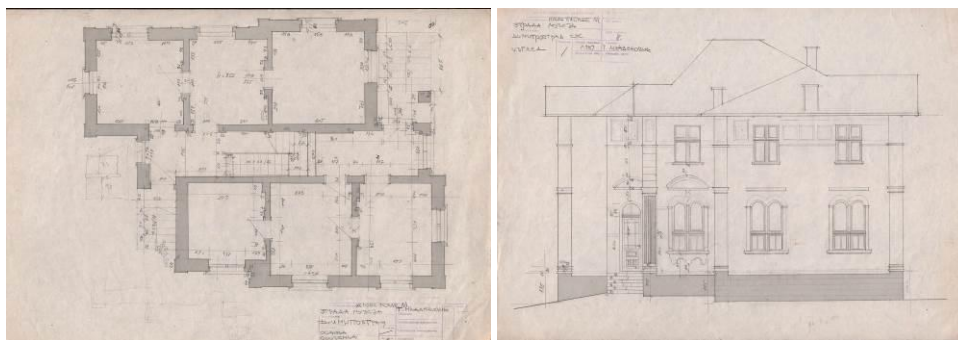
Ground floor plan (left), drawing by R. Stojanović, façade viewed from Nišava street (right), drawing by T. Mladenović, 1989, [2]
